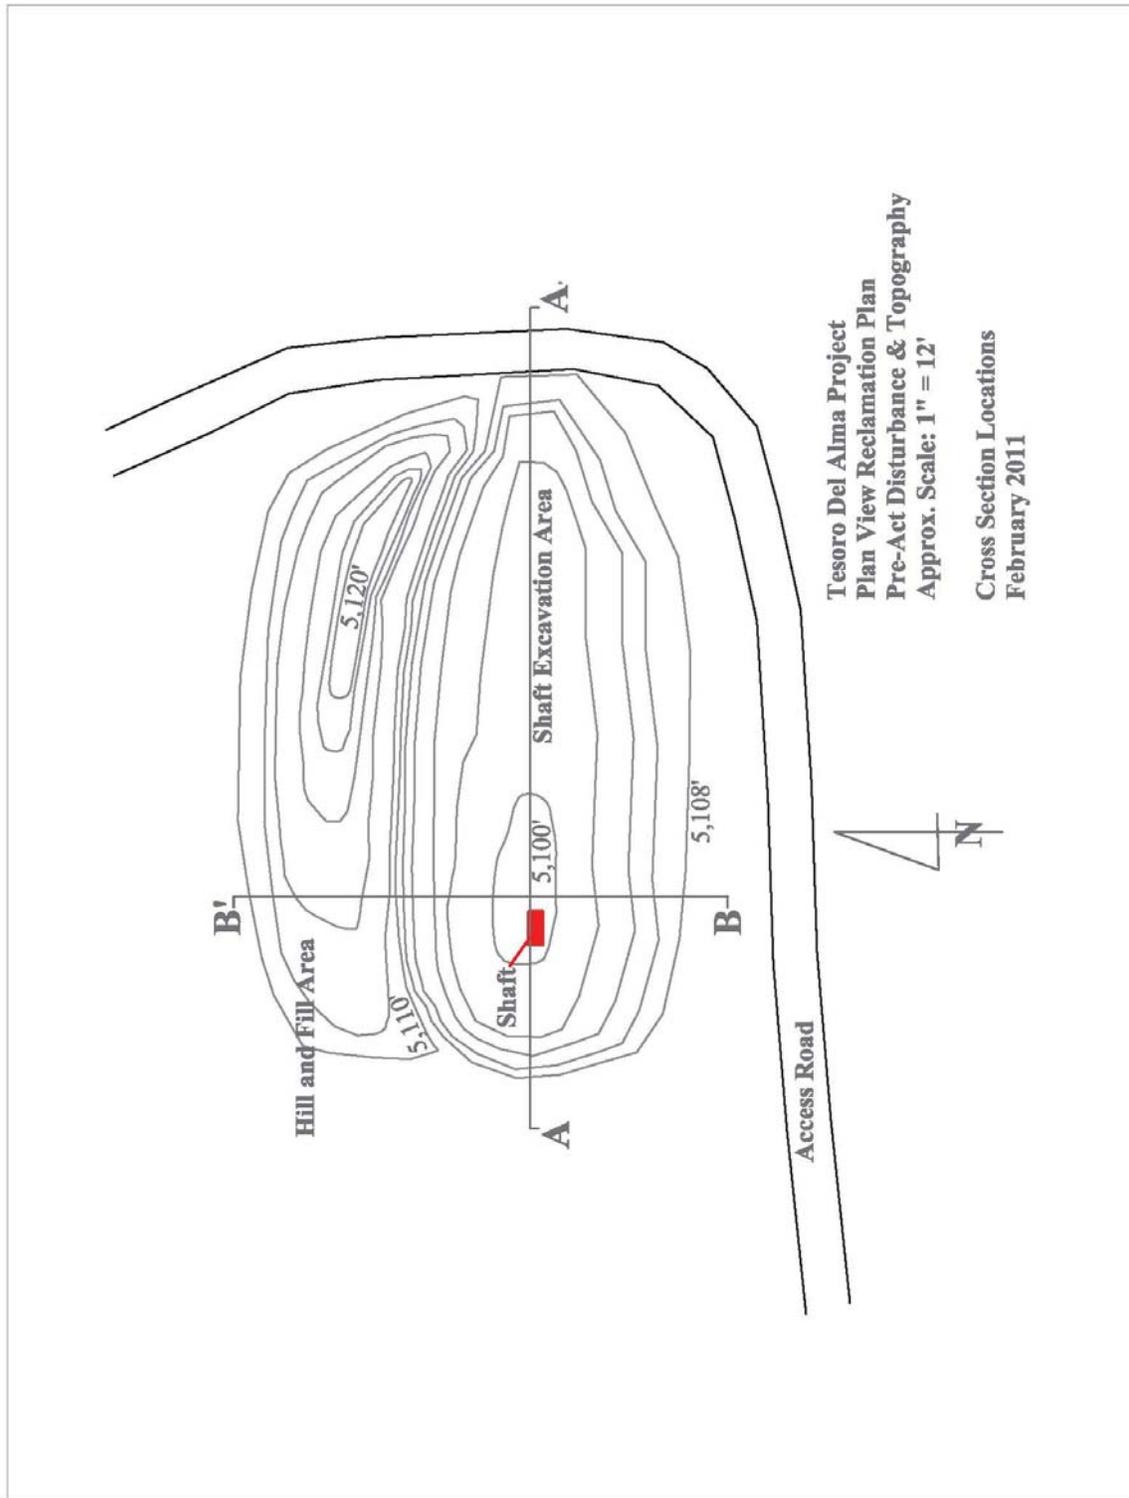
Appendix A Plan View. Hill and Fill Area. Shaft Excavation Area and Access Road.
